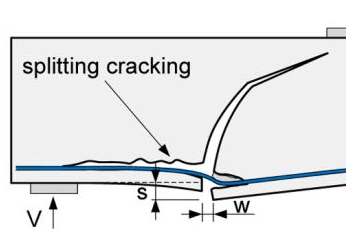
Sketch of the crack openings related to the dowel action phenomenon (Autrup et al., 2023)
